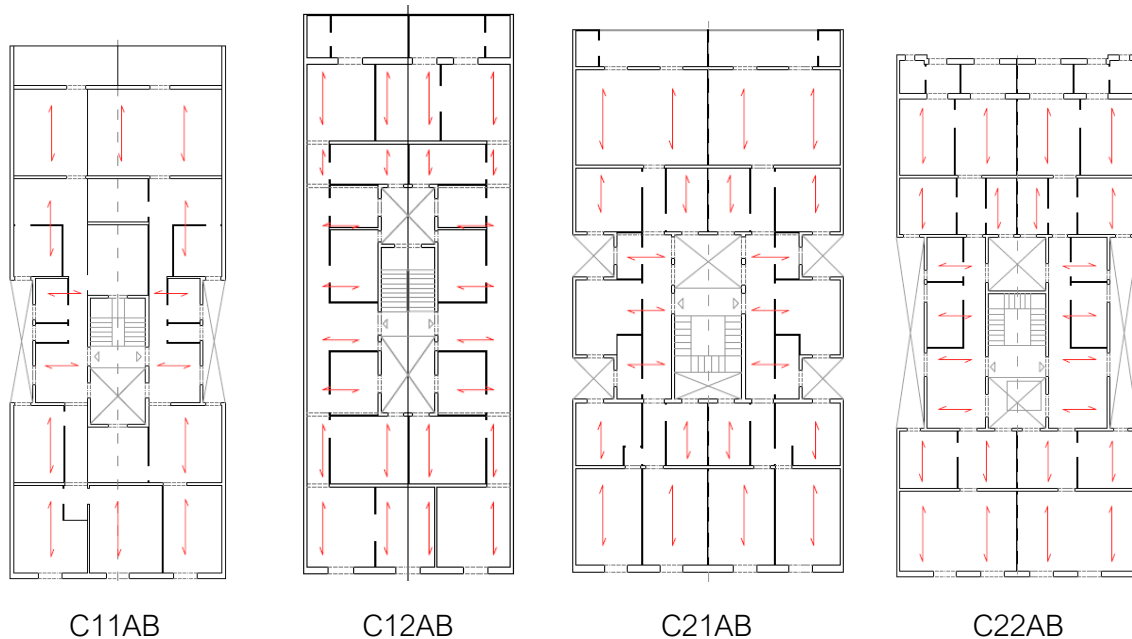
Examples of floor section plans of existing Eixample buildings by representing the subtypes of the building typology 'C' (Cornadó Bardón, 2015).
